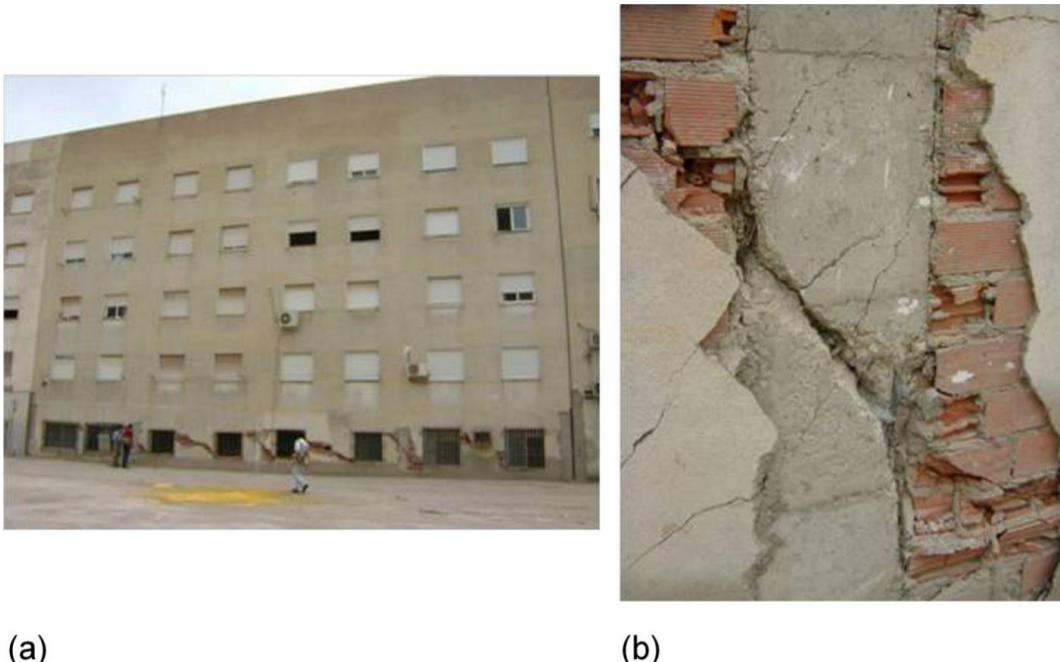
Example of cracks crossing a column at mid-floor height. Building (Fig. 16 a) Detail (Fig. 16 b).
